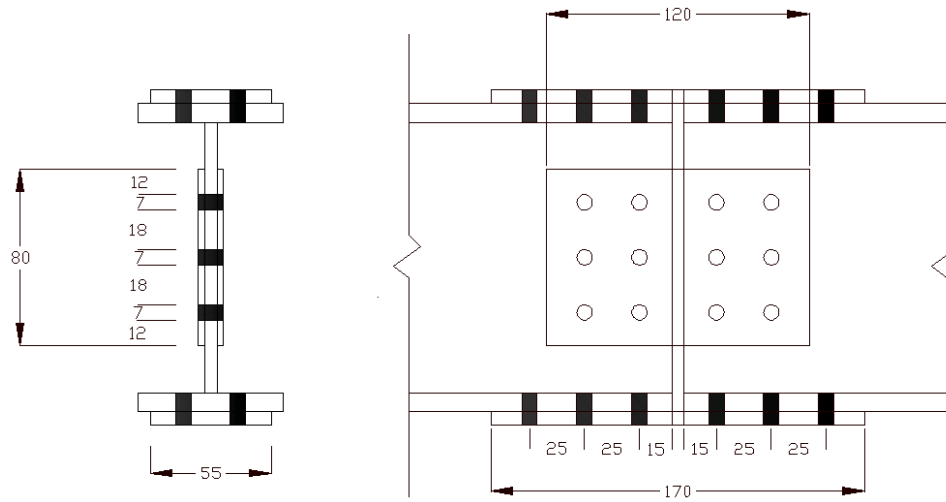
Flange & web plate bolted connection dimensions (mm)
